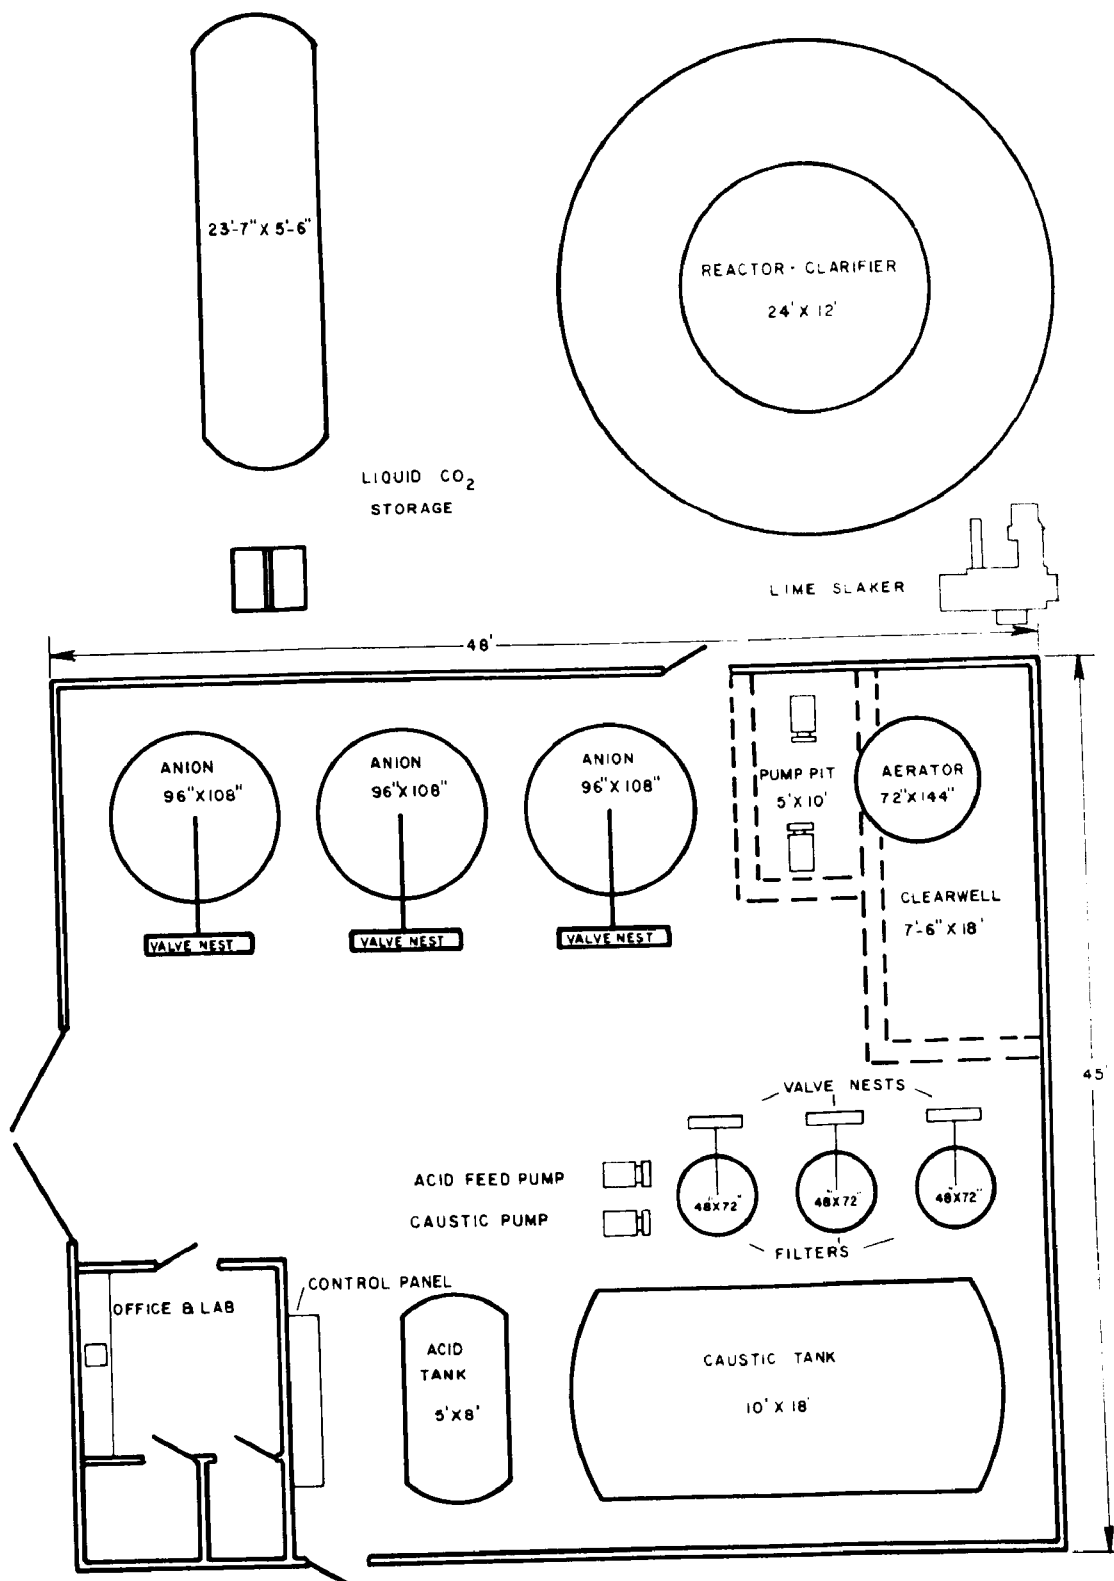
AWD Treatment Plant Plan, Modified Desal System
